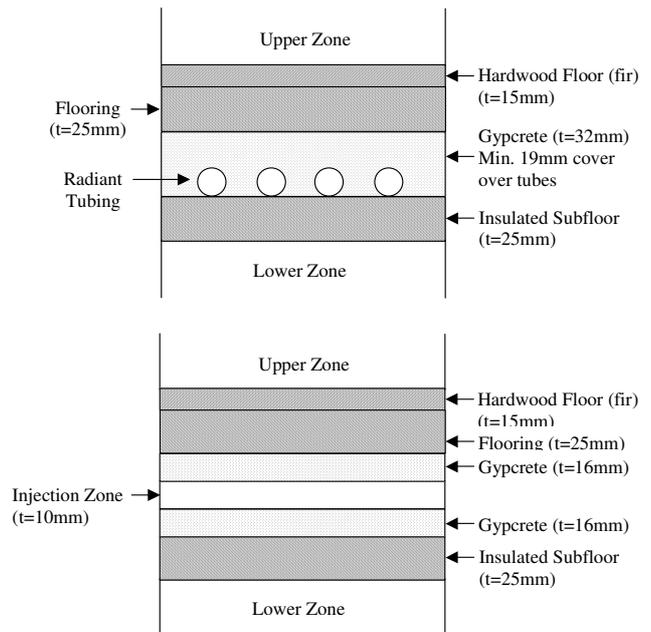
Common Wood Flooring Over Radiant Floor Heat Detail (top) and Diagram of Modelled Injection Zone and Flooring (bottom)
